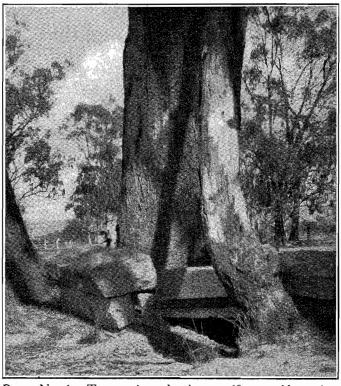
Trees estimated to be over 60 years old growing out of abutment of stone culvert, North-Eastern Highway.
